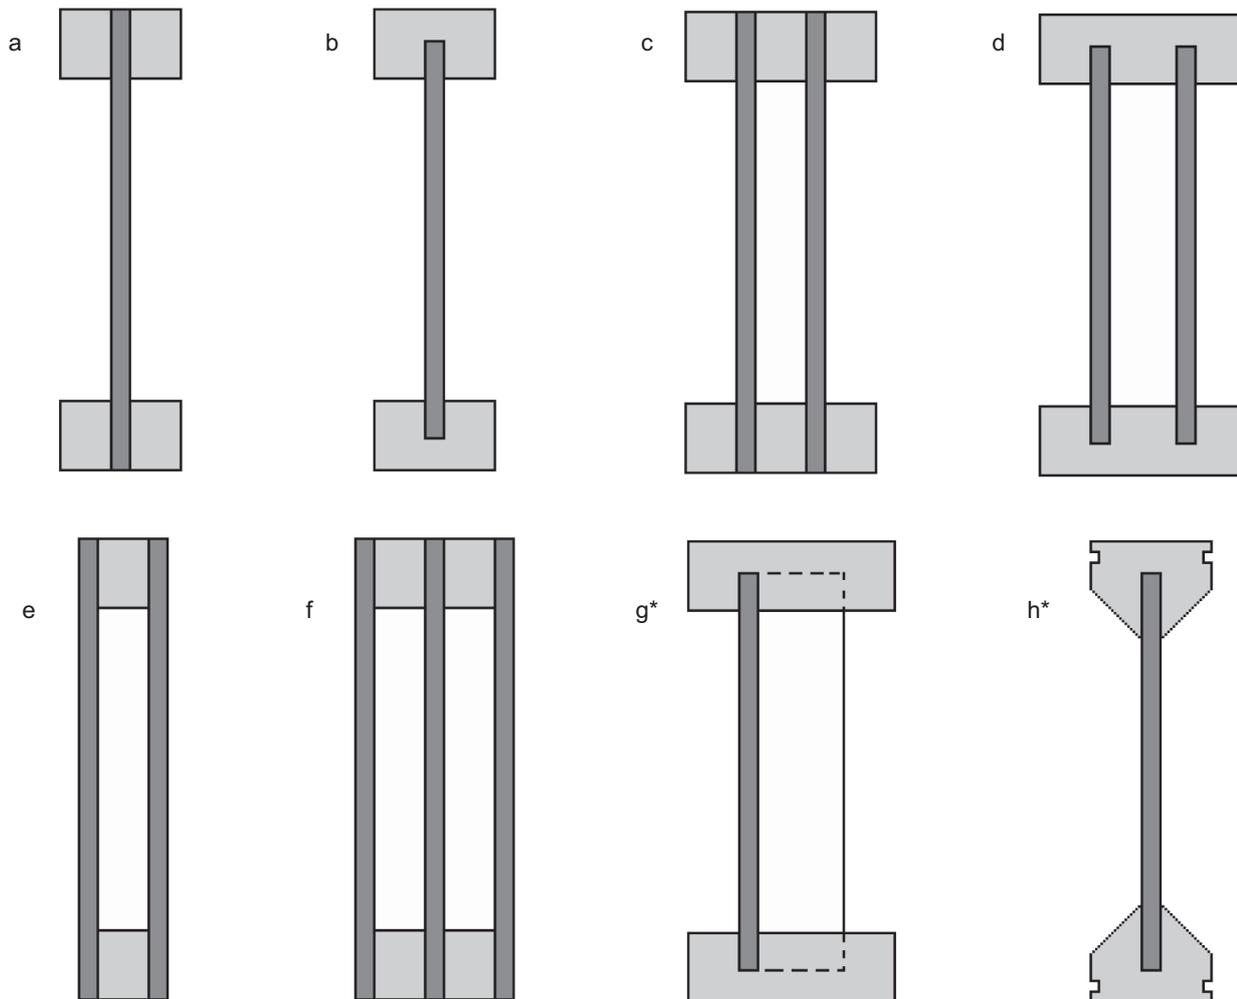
Typical forms of timber box beams and I-beams (*patented designs)
